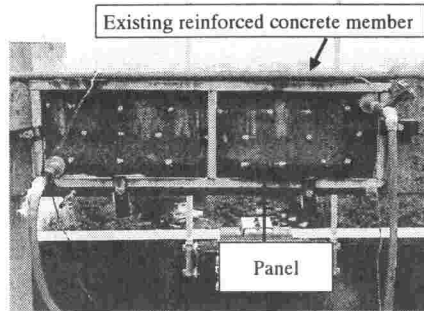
Application method of electrodeposition to existing reinforced concrete member
